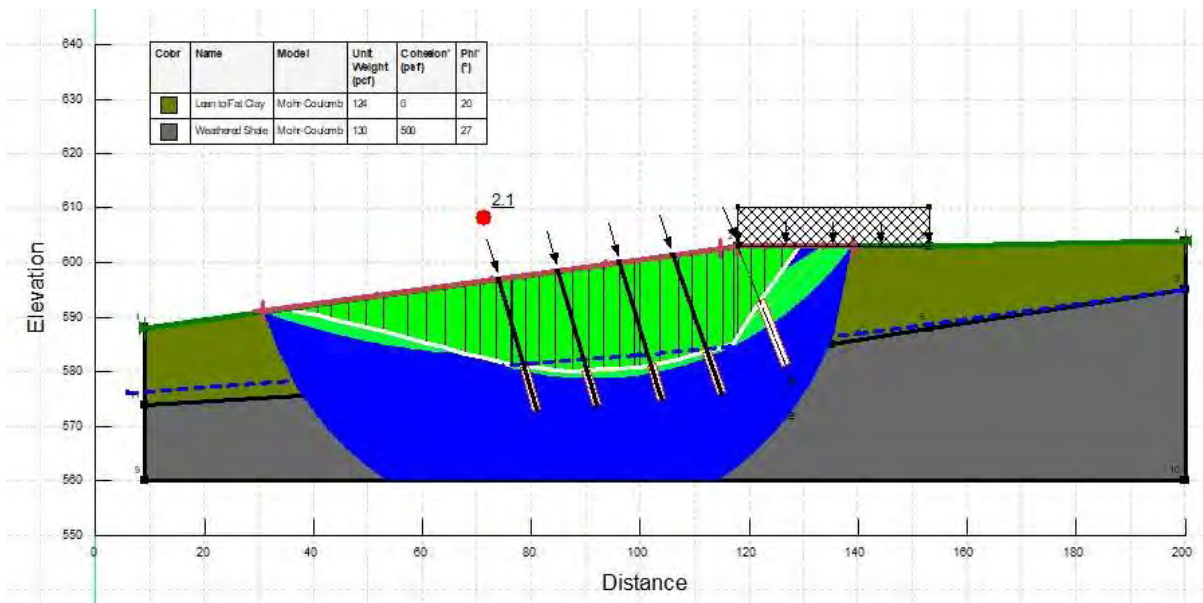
Soil nail reinforced slide near borings B-7, B-7A, & B-7B.
